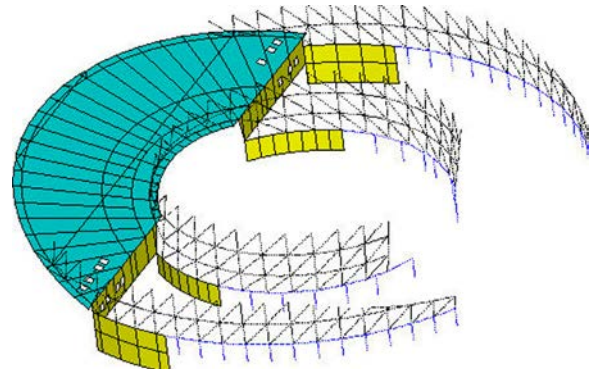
Modelling for below-grade structures: diaphragm walls for trusses and wall beam shown (in yellow), and columns and tie beam (in blue).
